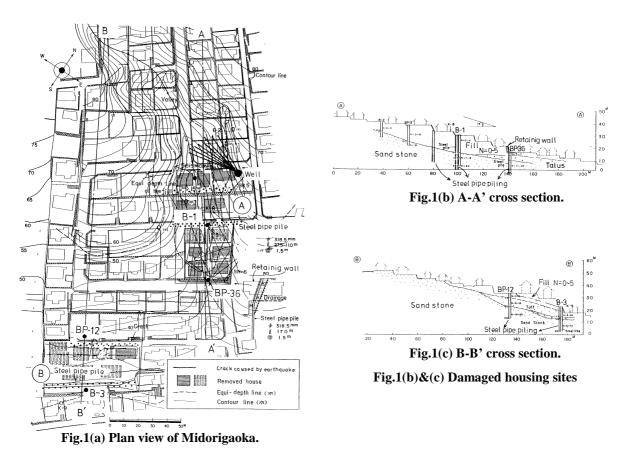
(a) shows an aerial view of extremely damaged housing sites in Midorigaoka-1chome. Eleven houses in block A and seven houses in block B, indicating by hatching, were so severely damaged by the earthquake that their owners were obliged to move. Approximately twenty years ago, a steep valley at an angle of almost 15 degrees existed along the A-A' line of block A. Housing sites were constructed by filling in the slope of the valley with loam and gravel, fractured sandstone, mudstone and tuff to a depth of between 5m and 10m. This fill was not compacted. The cross-section along the A-A' line is shown in Fig.1(b). Loose sandstone and talus lies under the fill with N values varying from 0 to ten. The slope has moving both in the direction of A-A' and perpendicular to A-A'. In addition, in the six months following the earthquake, extreme variation was observed at
